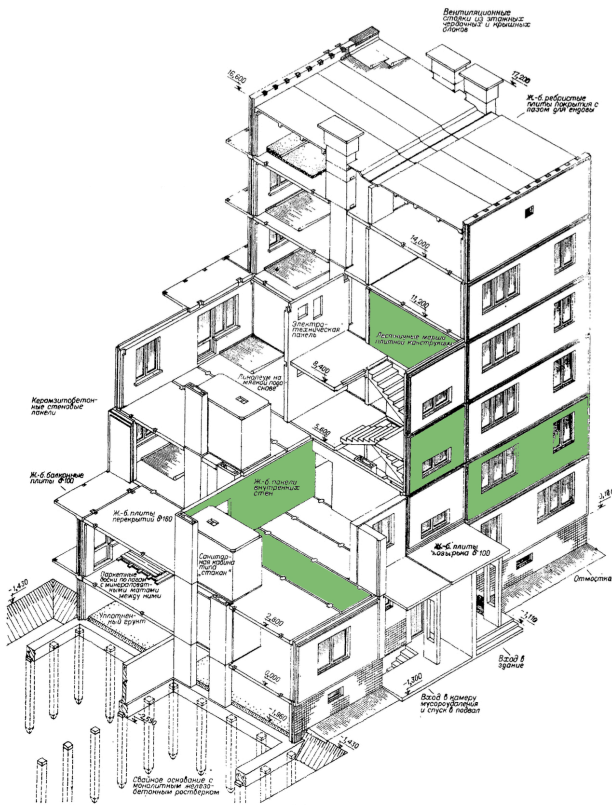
Axonometric Structural scheme. Longitudinal and facade walls with larger spans <sup>[31]</sup>
